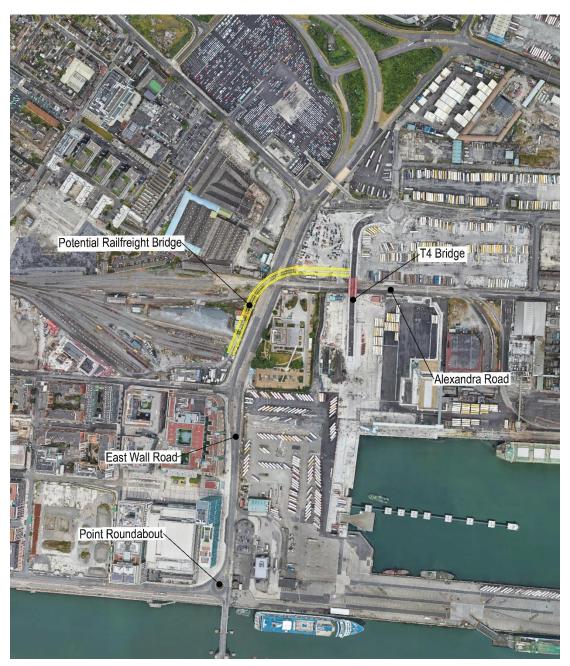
DPC's suggested rail freight bridge across East Wall Road
